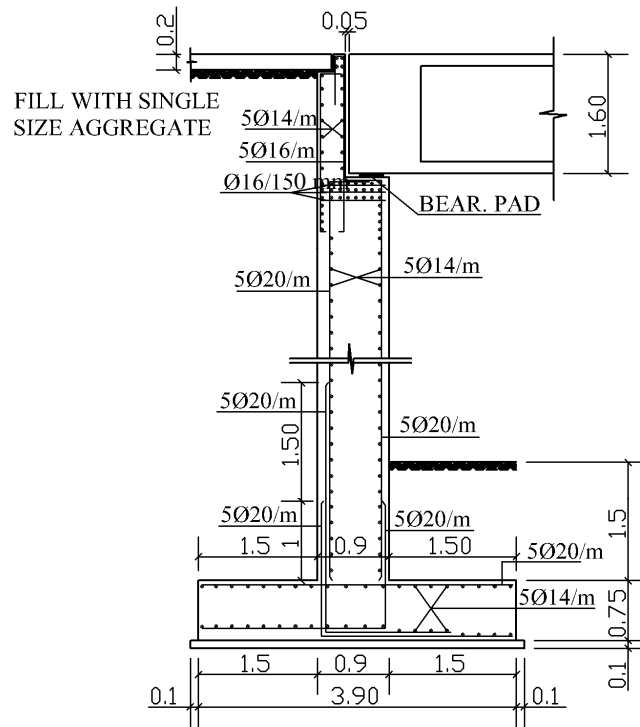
Alnasha Bridge Abutment #1 details (Dimensions in meter).
